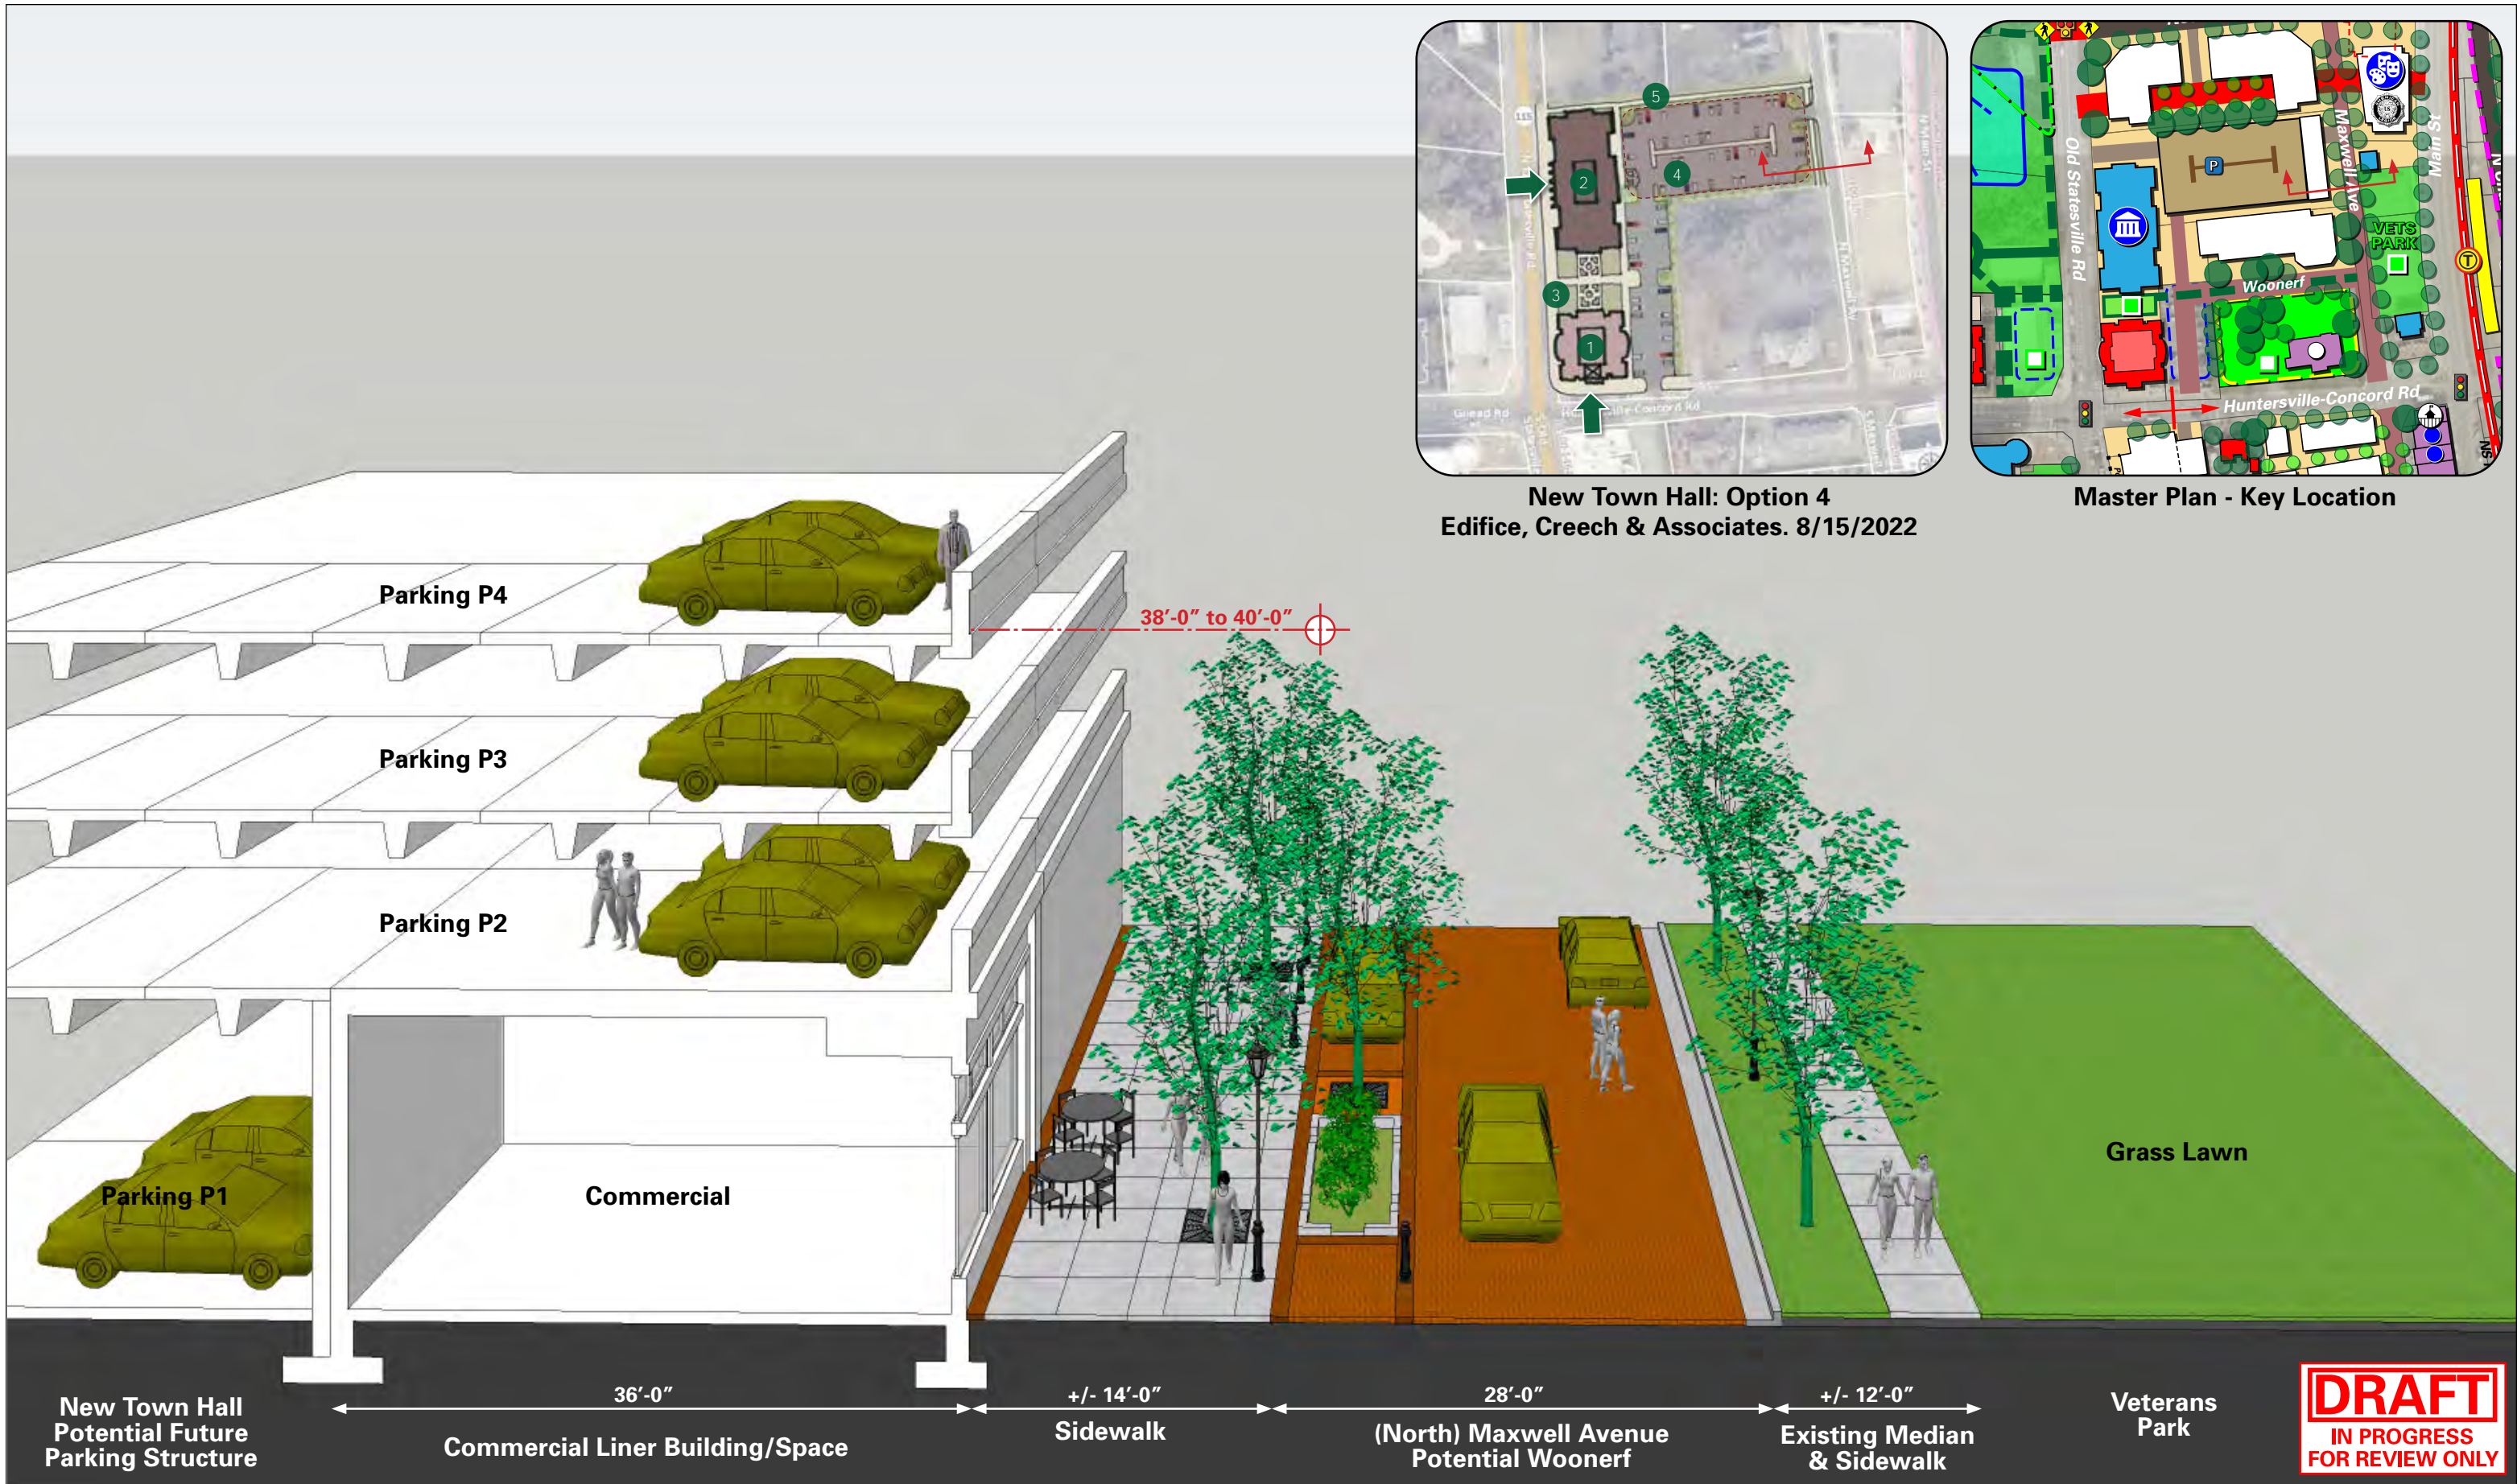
Conceptual Vision Plan: Northwest Quadrant - Future Town Hall Conceptual Parking Structure Frontage along Maxwell Avenue (Proposed Woonerf Street Type): Option B - Street Level Commercial Liner Building/Space.
